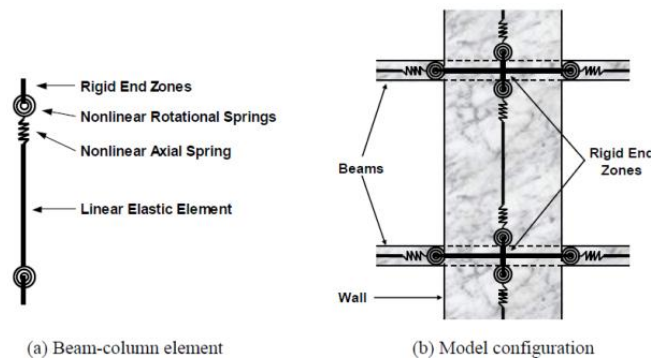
Modelling wall shear beam column element method (John Wallace, 2006)
